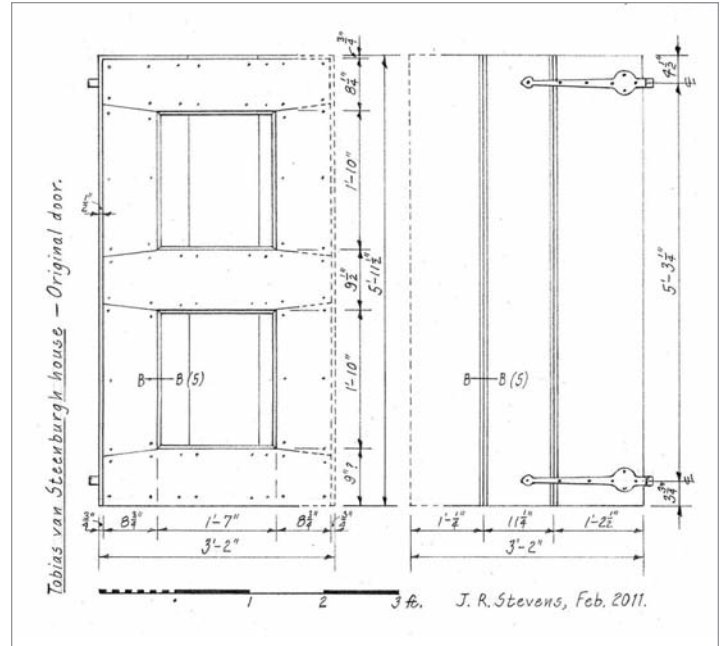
Tobias van Steenburgh House, detail, original door.
